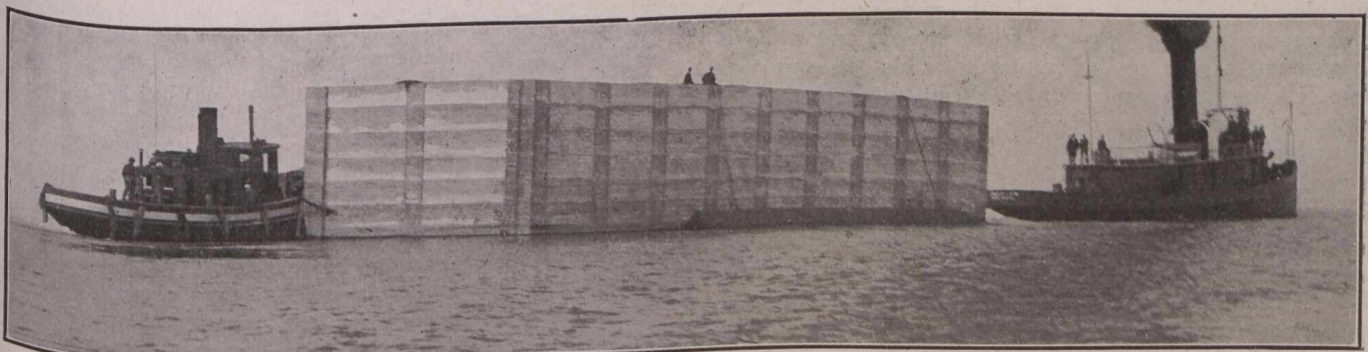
Completed Crib Being Towed to Port Weller Harbor Site.
